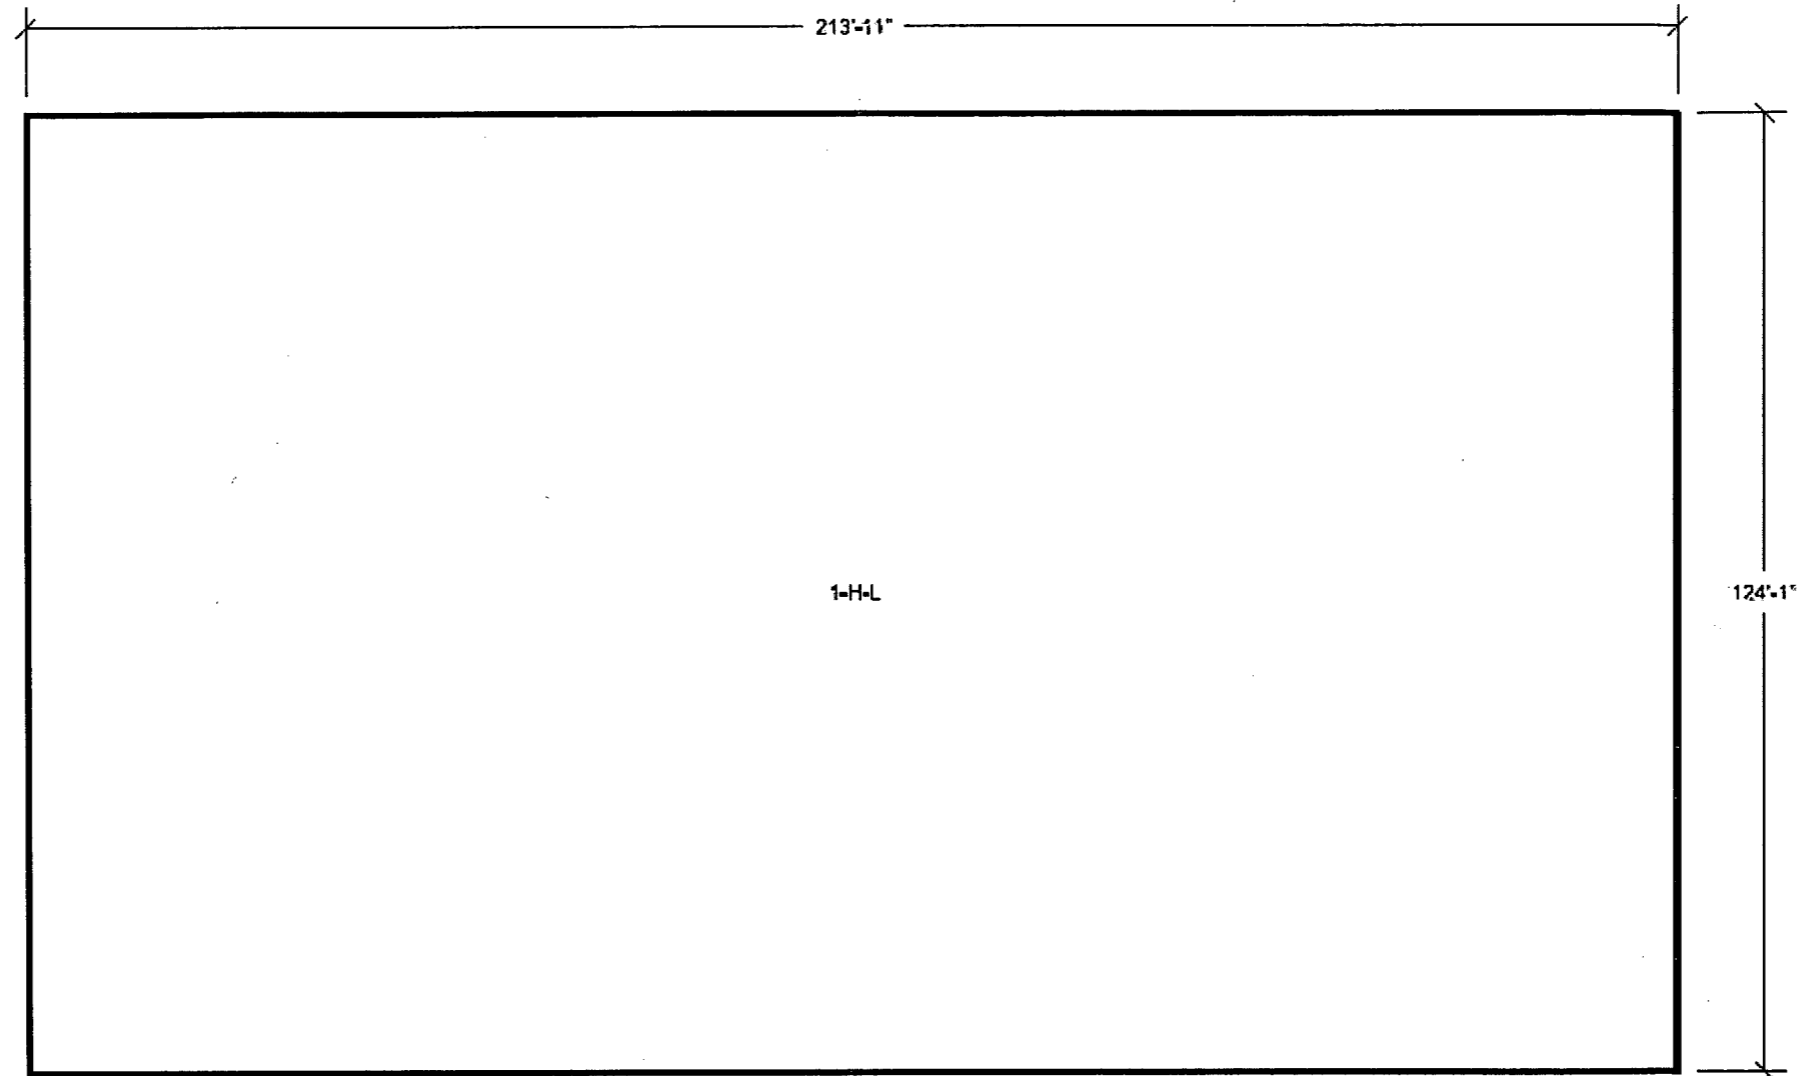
H.3-40: ELEVATION 95 LOOKING DOWN
